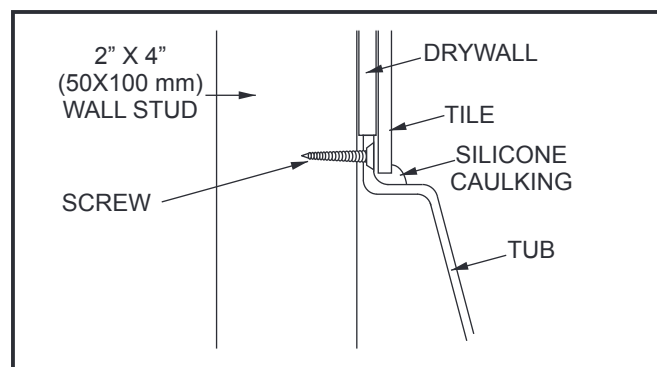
WALL INSTALLATION FOR TUBS WITH TILE FLANGE
